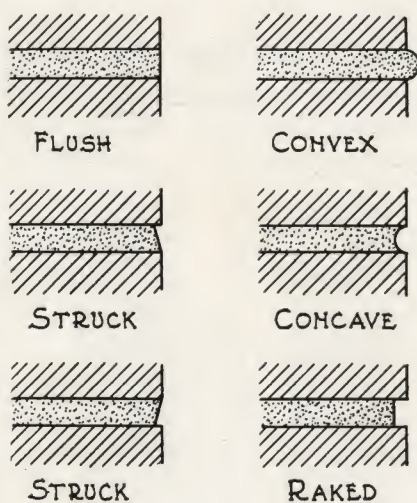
Mortar joints used in laying concrete block and building tile. The flush joint is used when stucco is to be applied. The struck joint and concave joint are recommended in face block construction.
